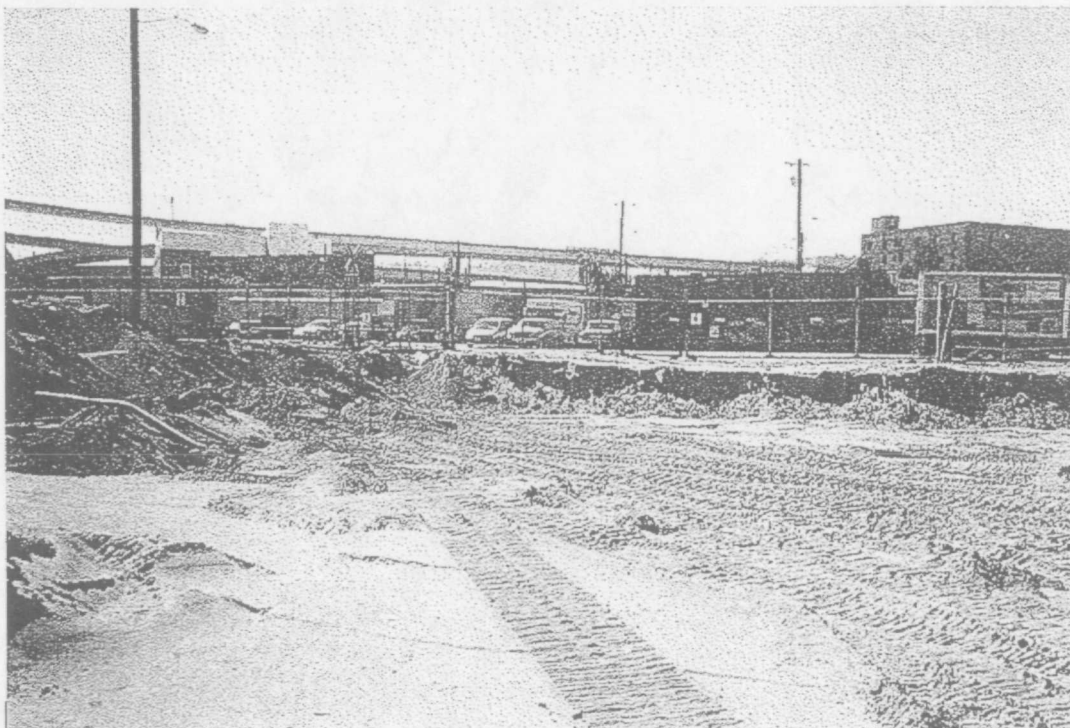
Test pit exploration adjacent to Area 1 (excavation depth 6 feet below ground surface).
